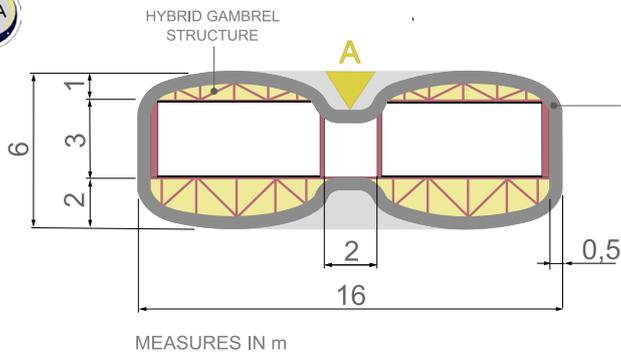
Cross-sectional view of floor/ceiling and internal frame structure and the membrane material layout
